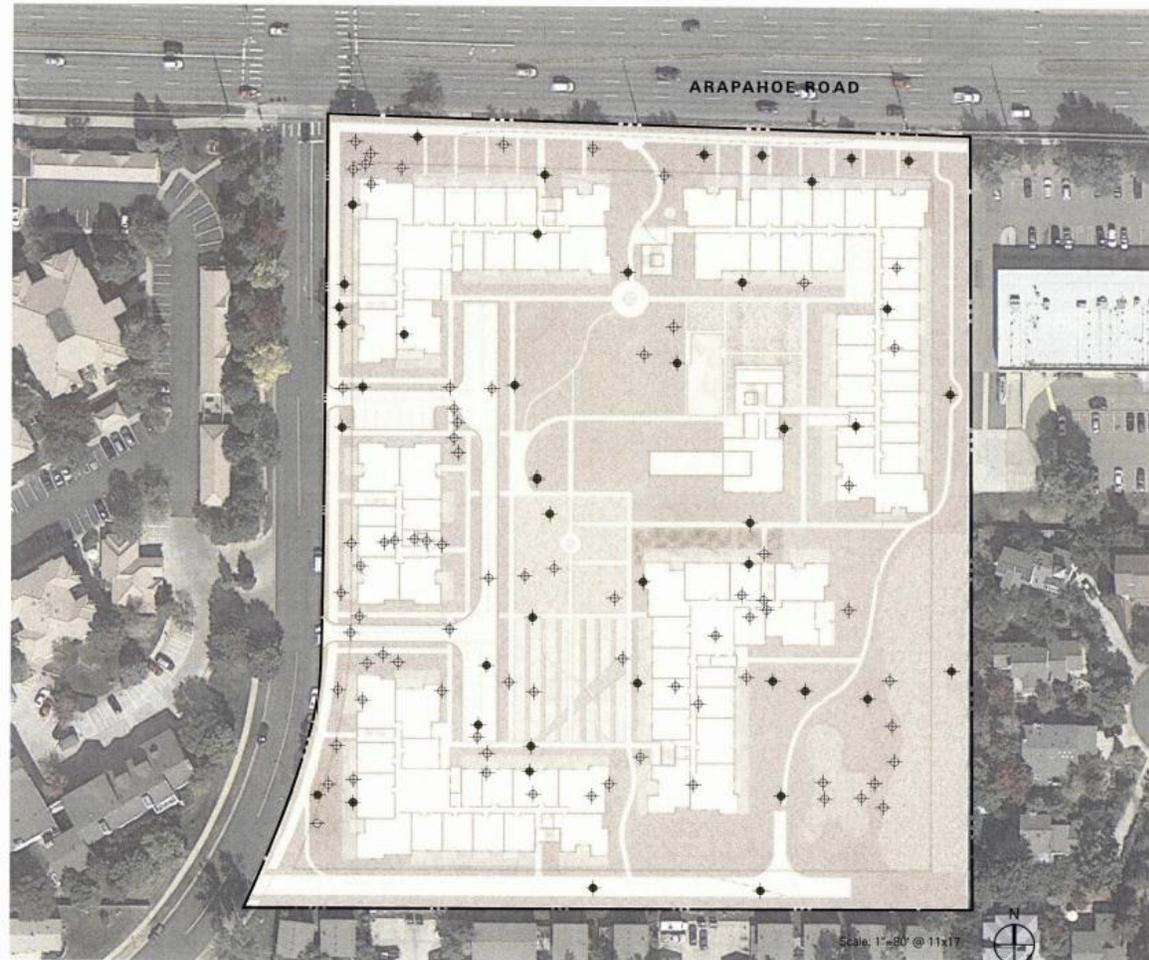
(Aerial – above) and 4b (ground level view) of existing apartment complex.
